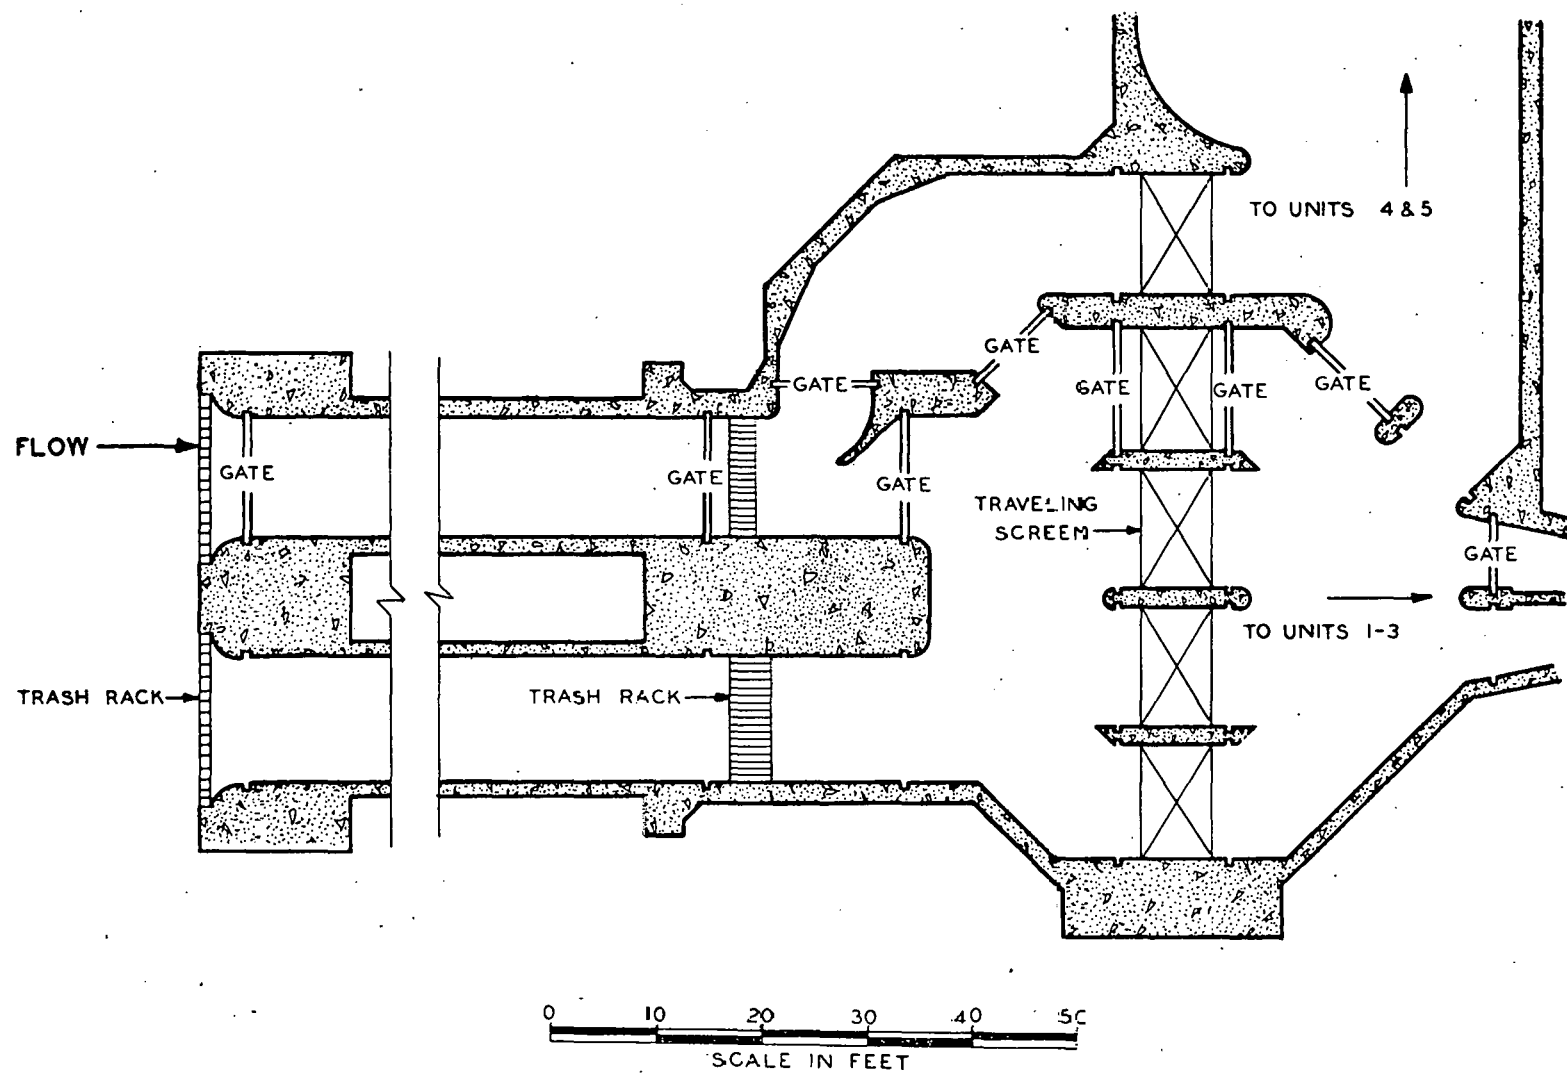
Plan at -14 Feet MSL of the Cooling-Water Intake Structure at Contra Costa Units 1-5.
